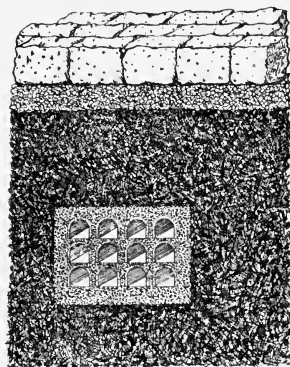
Twelve-Duct Cement Arch Conduit.
